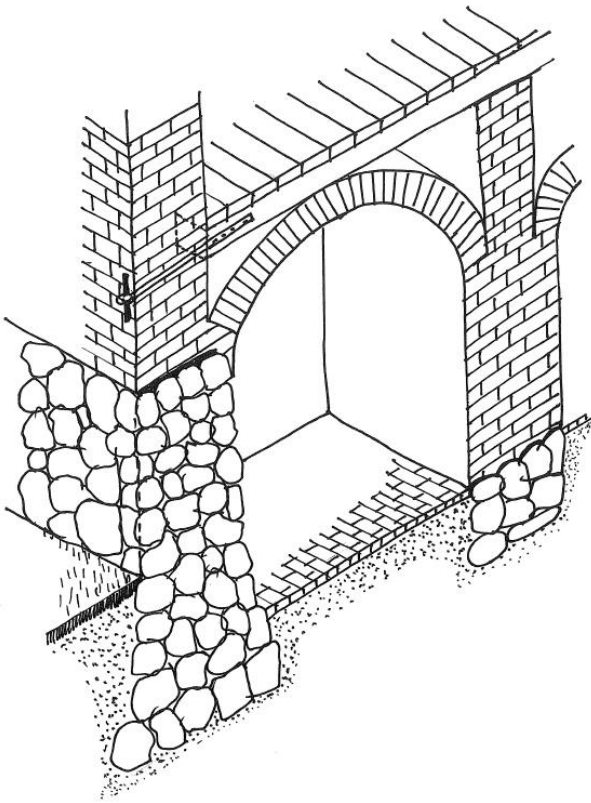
Foundations and foundation wall used on castles and churches (1300)
